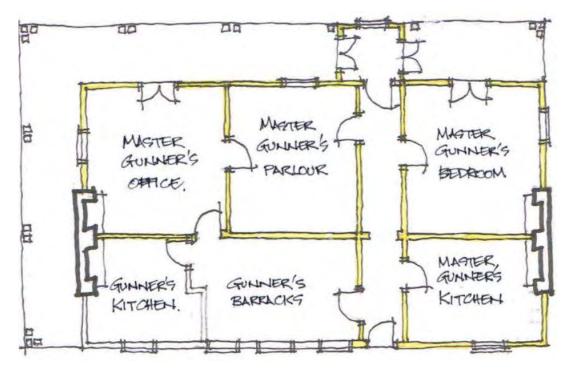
Interpretation of the potential original layout and use of rooms of the cottage at Shepherds Hill. (Source: Carr, John, Shepherds Hill Cottage Storm Damage Repairs SoHl Rev E, February 2017, p.8)
